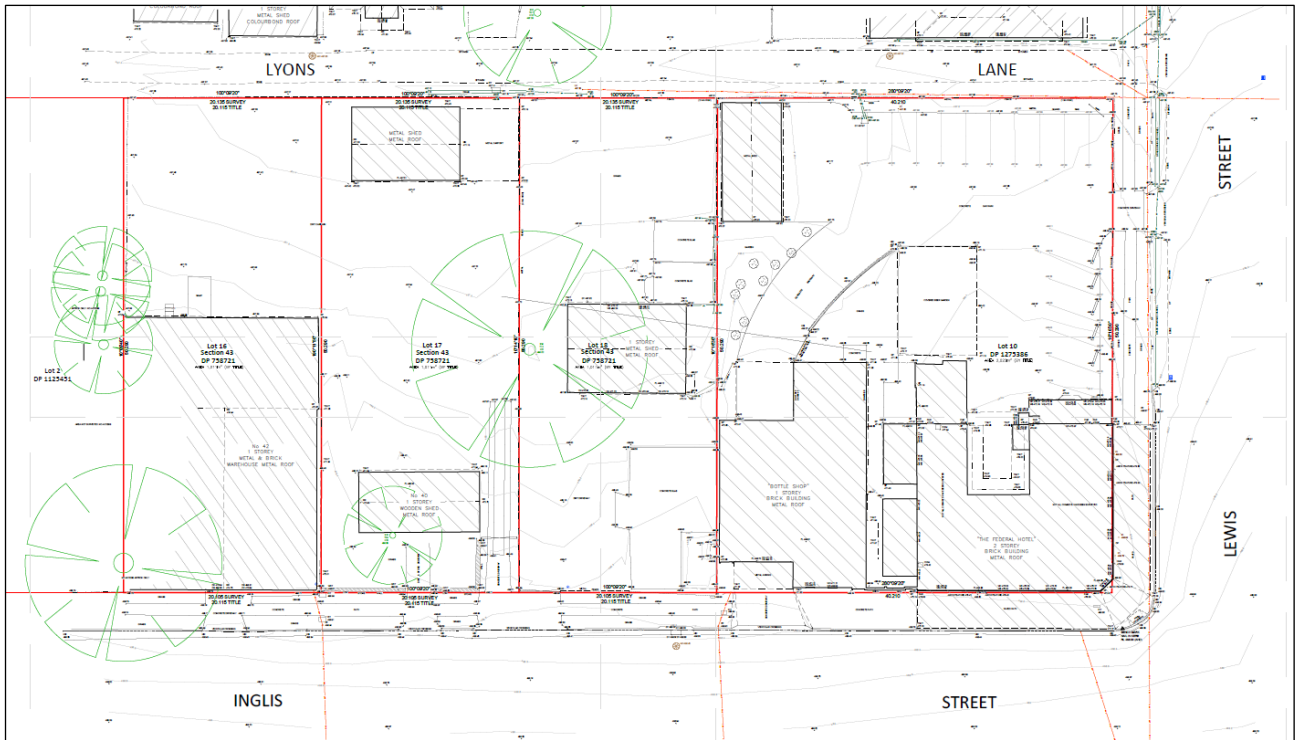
Survey Plan of the subject site – 34-42 Inglis Street, Mudgee. (Source: VMark Survey Pty Ltd)
